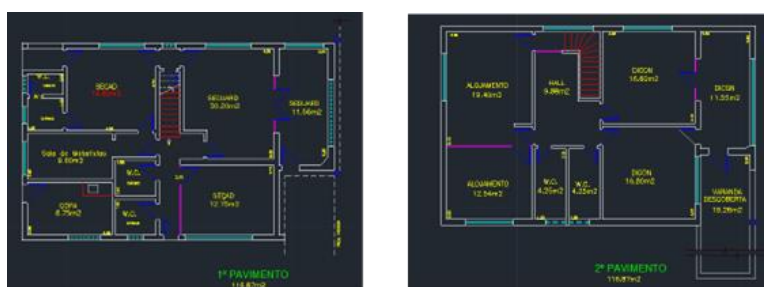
First And Second-Floor Plans, Respectively, Of Block F In The 1980s¹⁷.
